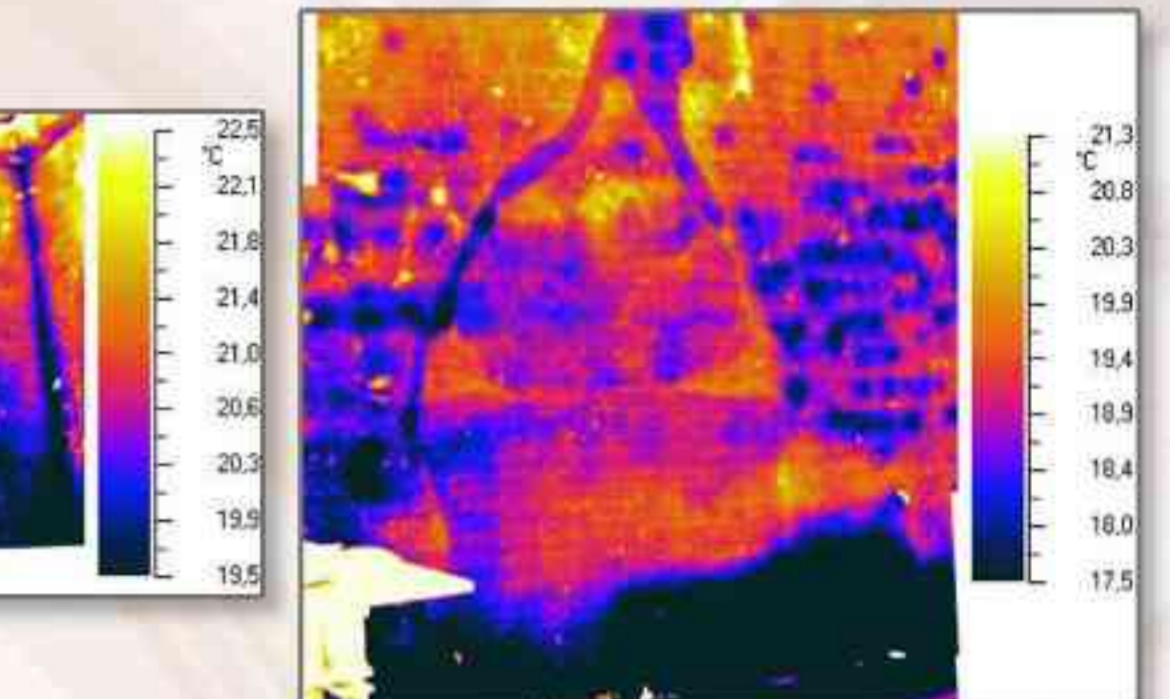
, IR Thermograms composite of wall "A", room # 2.1; it shows a infilled opening and plaster patches, arch shaped. Opening infilling consists of bricks, surrounding masonry has a bricks&pebbles texture.
